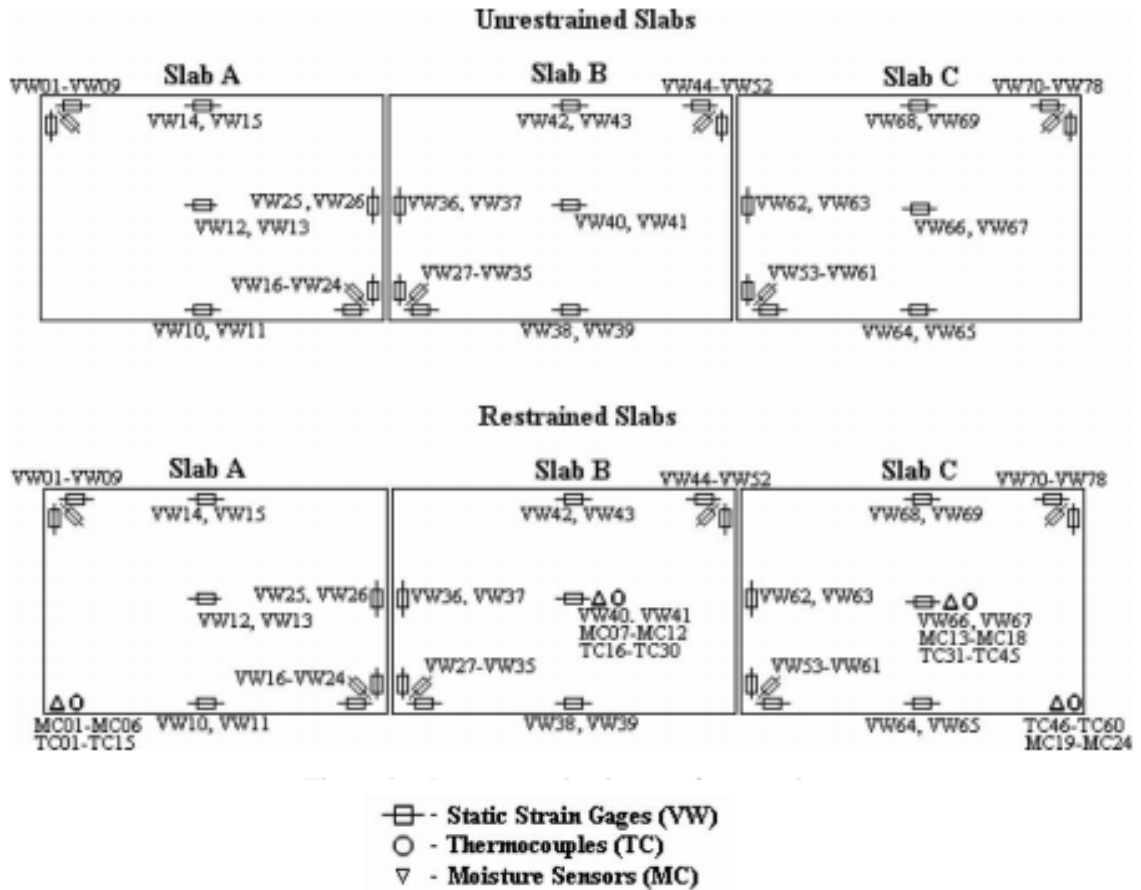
Instrumentation layout of test section in Murrysville, Pennsylvania (Wells et al. 2006).
